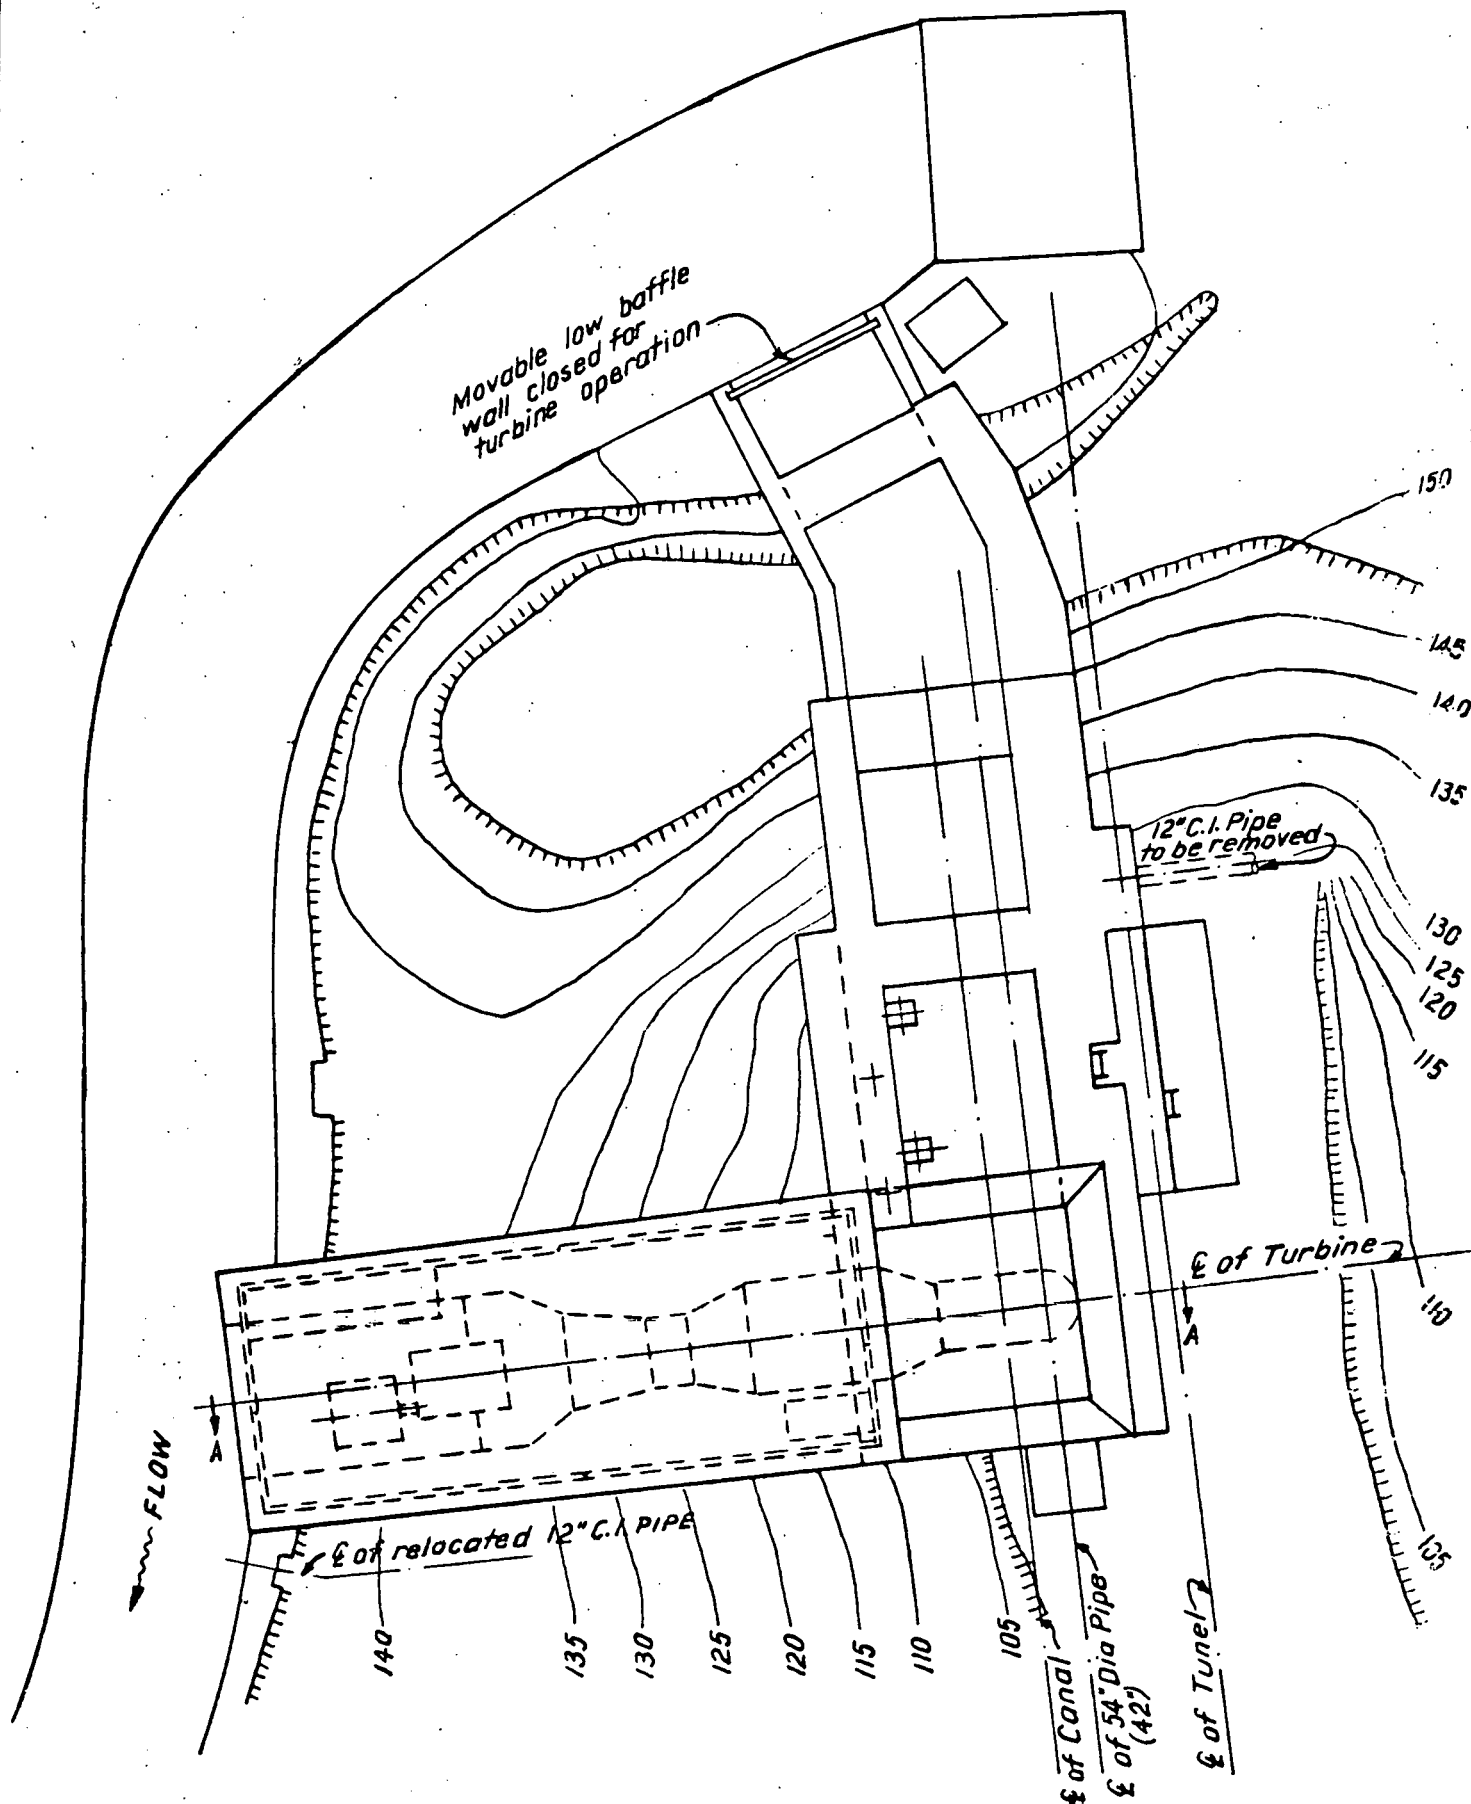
RETROFIT HYDROPOWER INSTALLATION at EARTH DAM OUTLET STRUCTURE
